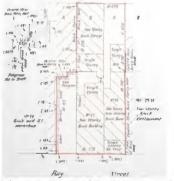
Survey Plan of Nos. 37 and 37 Bay Street, 1975
